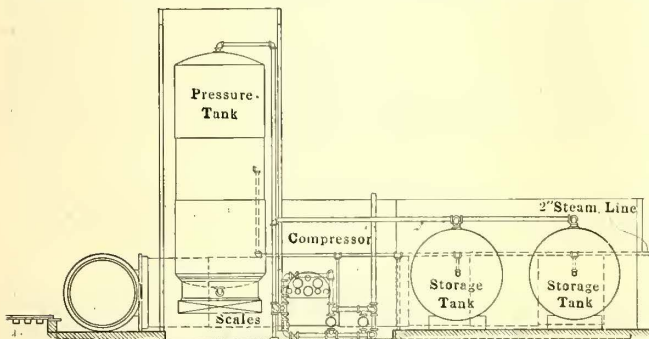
LONGITUDINAL SECTION OF CYLINDER HOUSE
